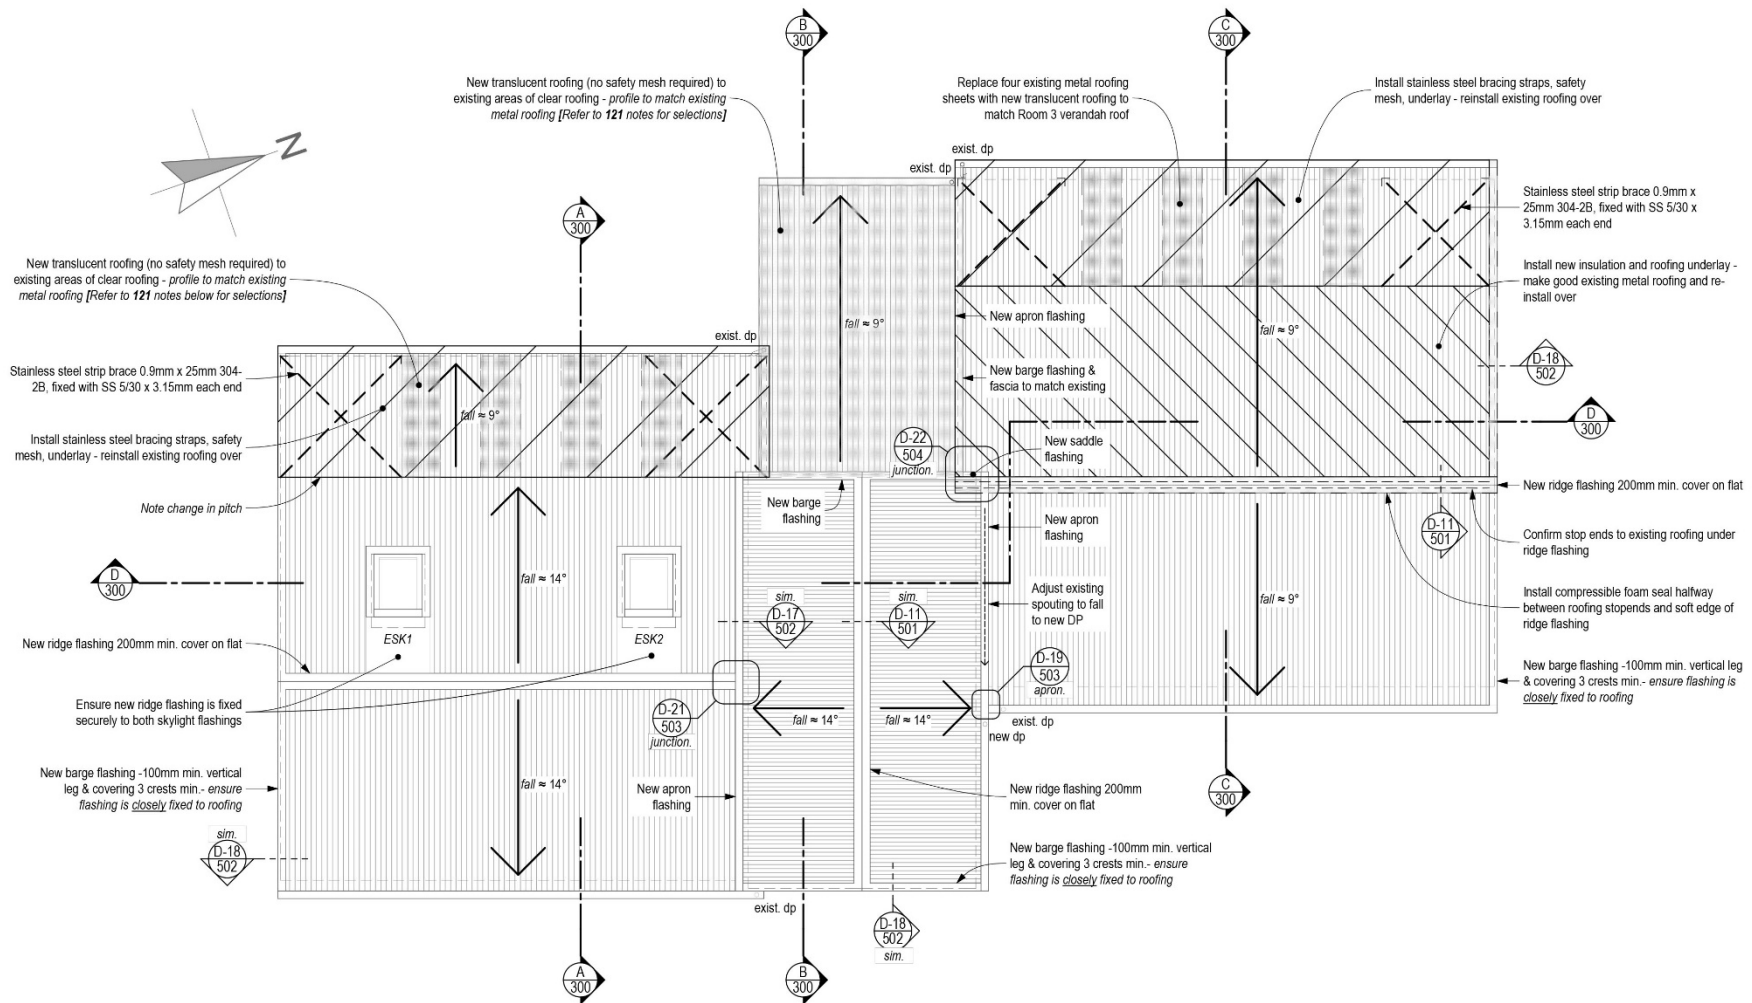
B Roof plans – Proposed works – 120 series Architectural drawings
